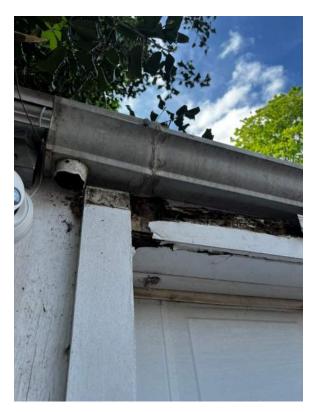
IMG_1067 – North Façade. Deteriorated overhead door trim and header. Missing downspouts. Deteriorated seams at gutter.
